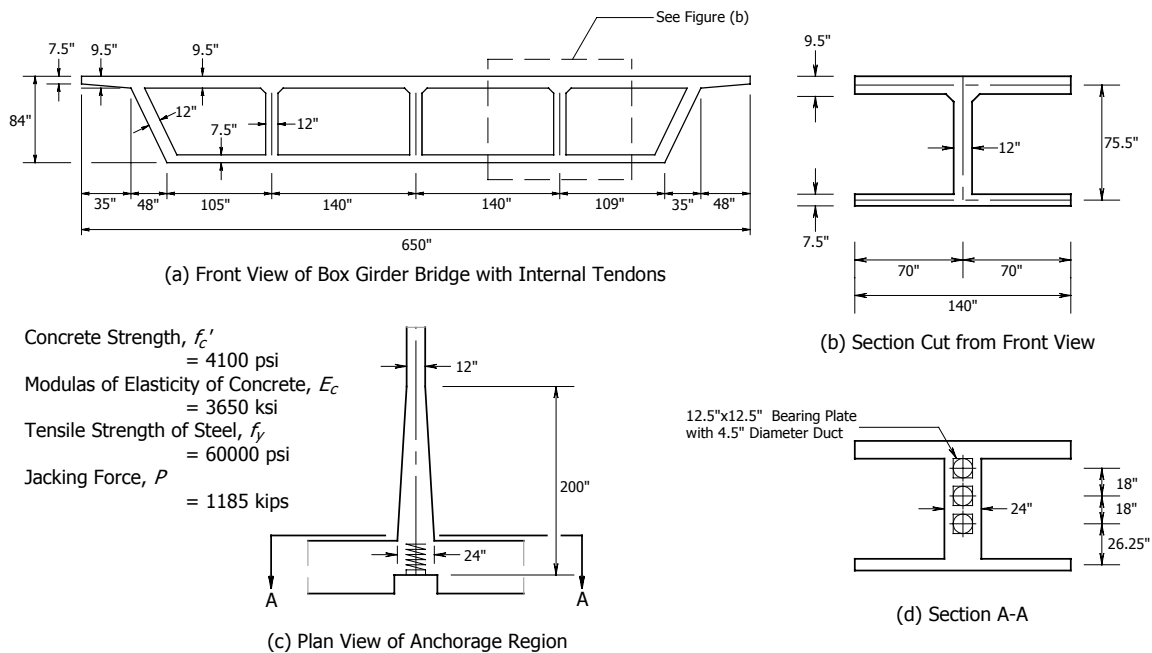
BOX GIRDER BRIDGE DETAILS AND DIMENSIONS
